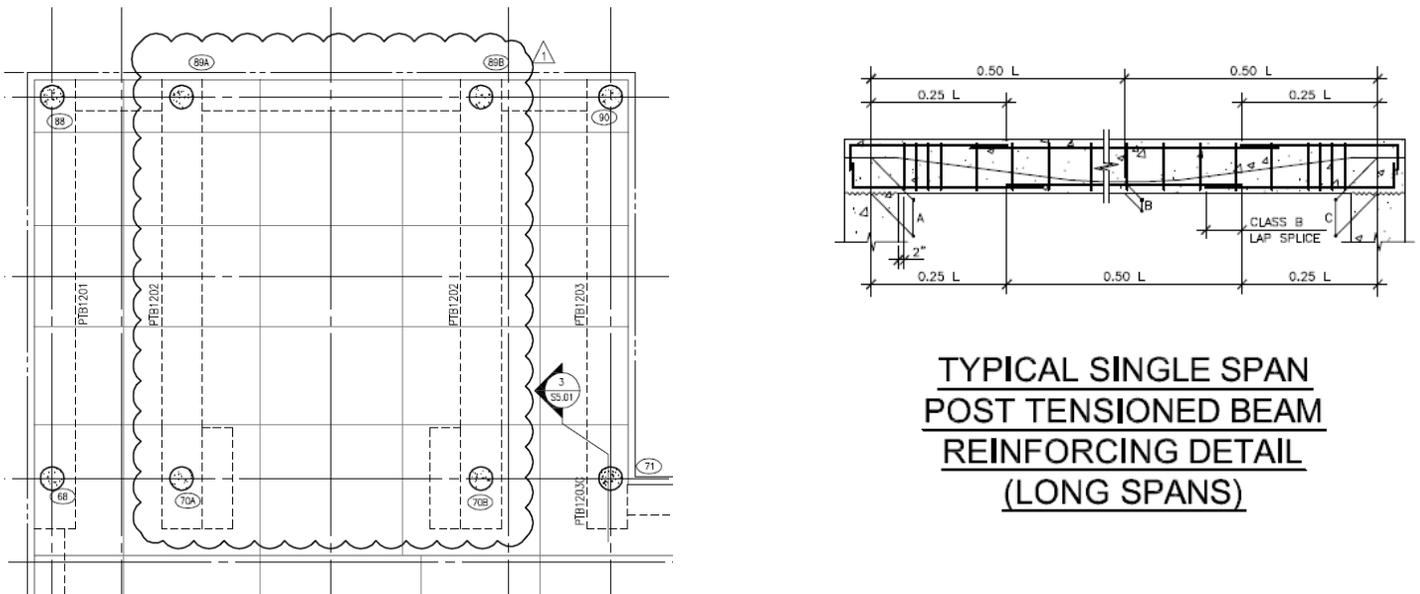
Plan view and typical detail of Post-tension beams supporting slab on levels above two-story loading dock
